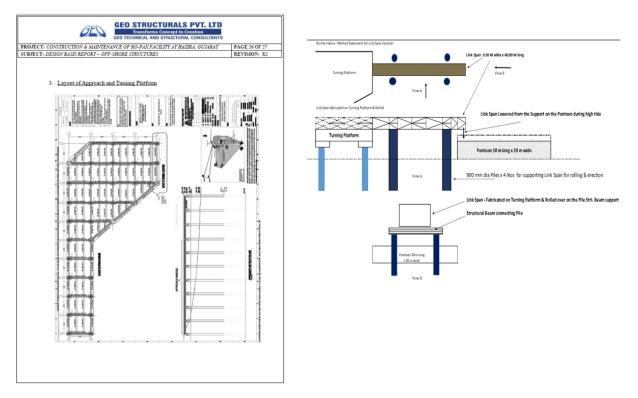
Layout of Approach and Turning Platform and details of link span erection
